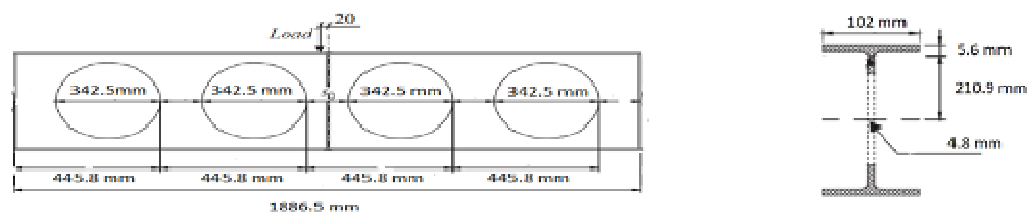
Details of tested Specimen A2 (L.F. Grilo et al.2018)
